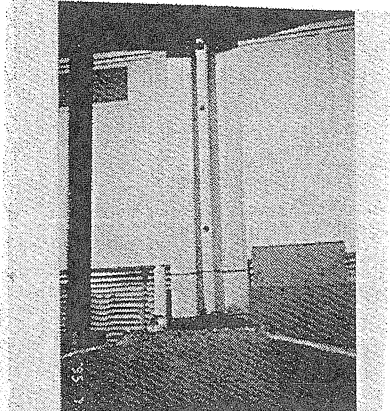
Test Set-up to Determine Tearing Load at the Lap Joints
